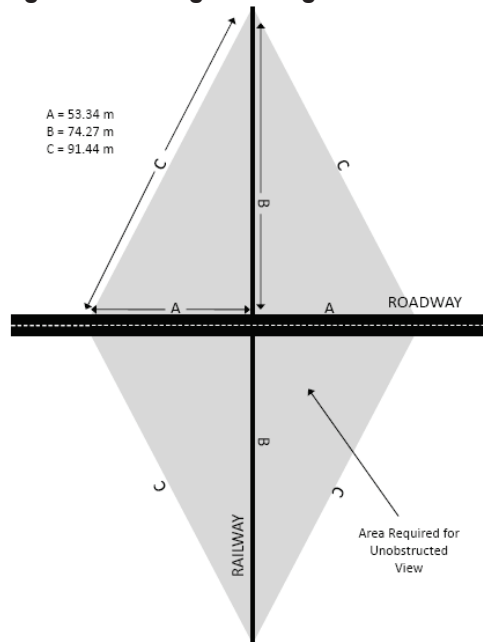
Sight Triangle at Intersection of Lanes
